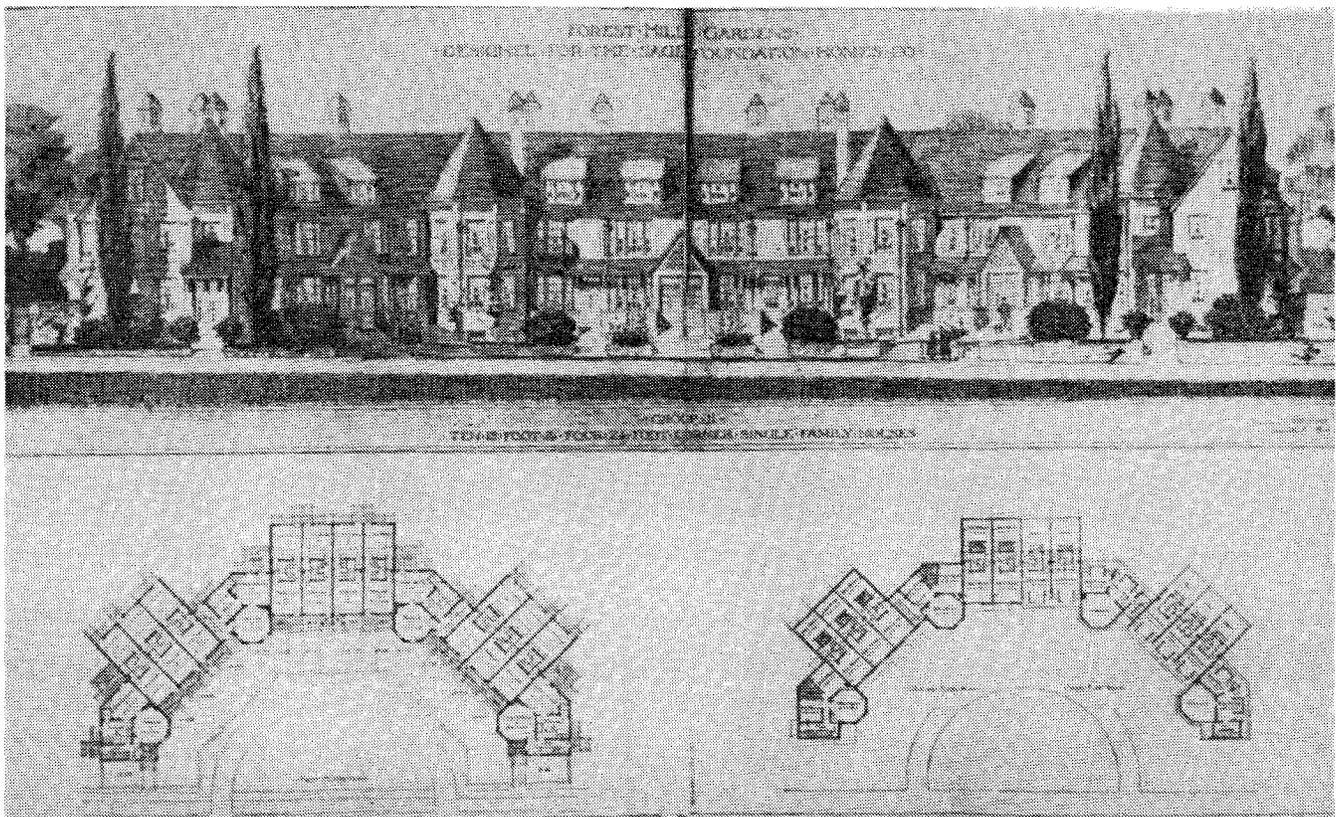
Forest Hills Gardens. Group II Townhouses, Rendering and Plans, 1912. Source: Forest Hills Gardens (New York: Sage Homes Company, 1913).
